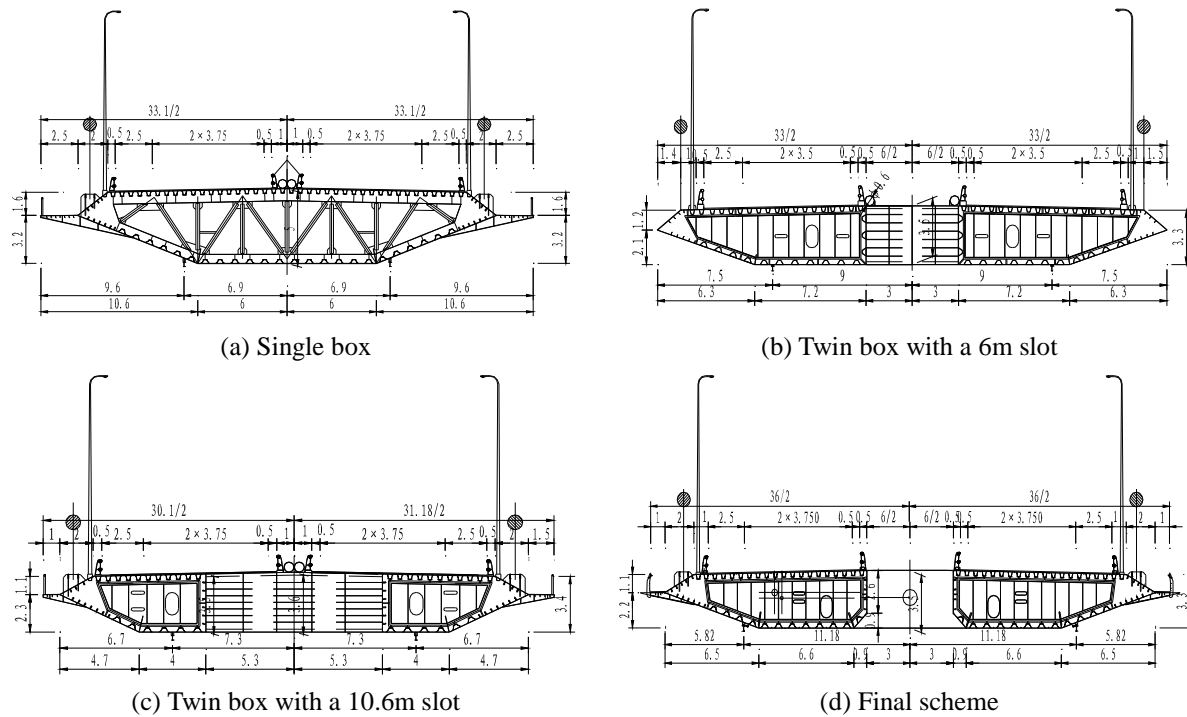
Proposed box girder sections for Zhejiang Xihoumen Bridge (Unit: m)
